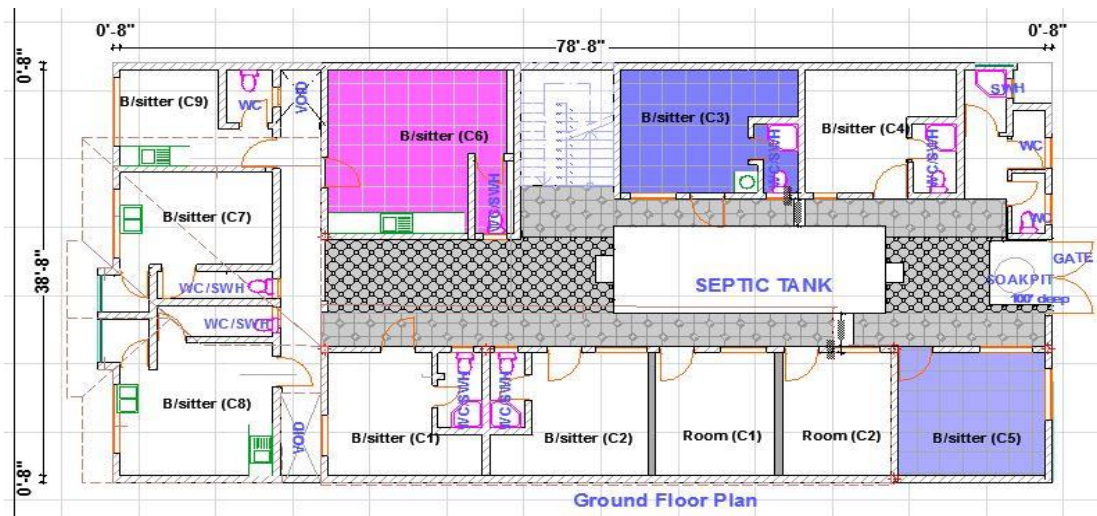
A: Floor Plan Sketch to Show Septic Points and Walling
